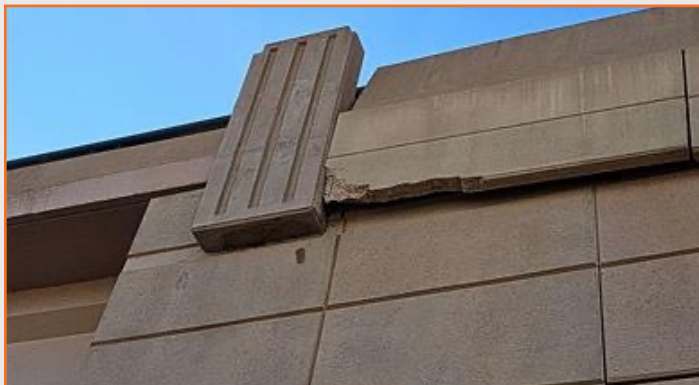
CTP retaining wall coping spall on SBML at damage NBML at SH-183.
